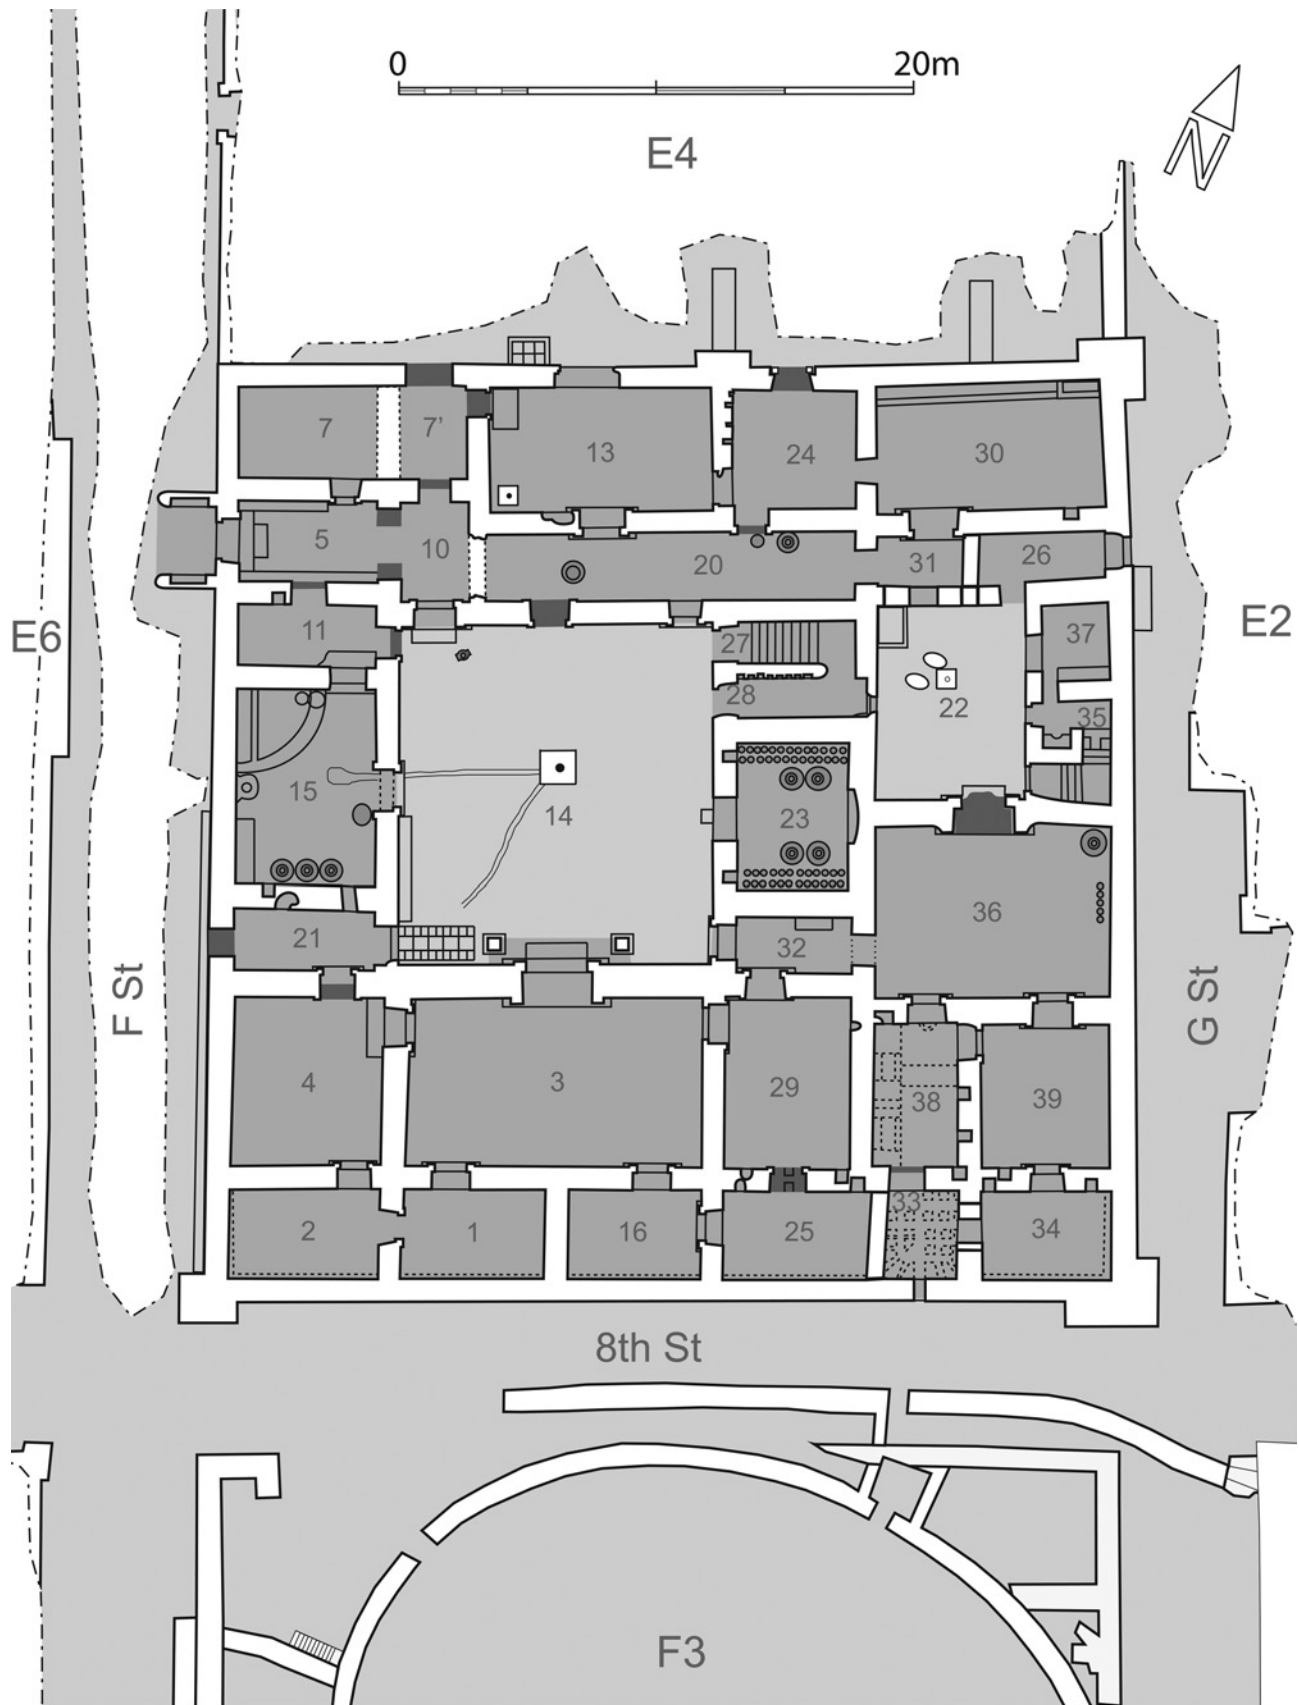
Plan of the E4 house after Baird's drawing, Knox's published plan, and Detweiler's survey. (With thanks to Jennifer Baird.) The darker grey connotes roofed spaces around the two open courts.
